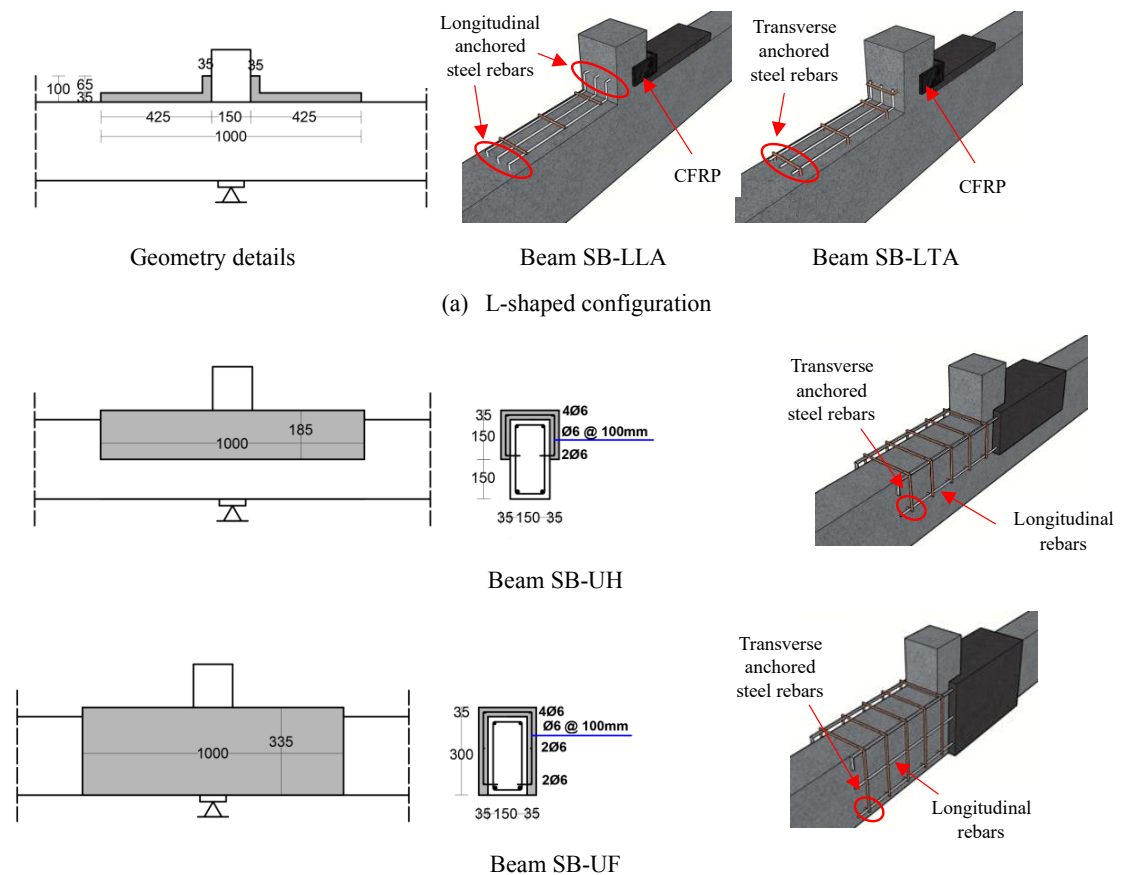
Geometry and reinforcement details of strengthening configurations (all dimensions in mm).
